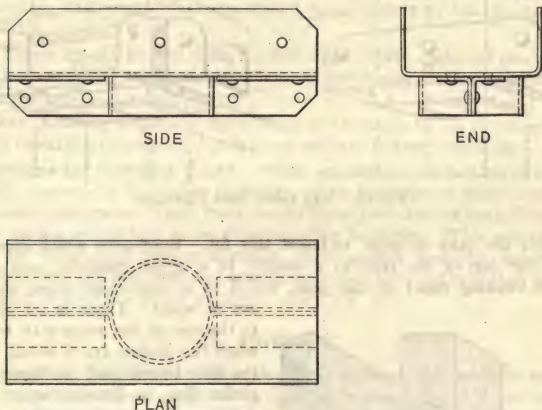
Steel Post-cap for Cylindrical Wooden Post. Elevations and Plan
